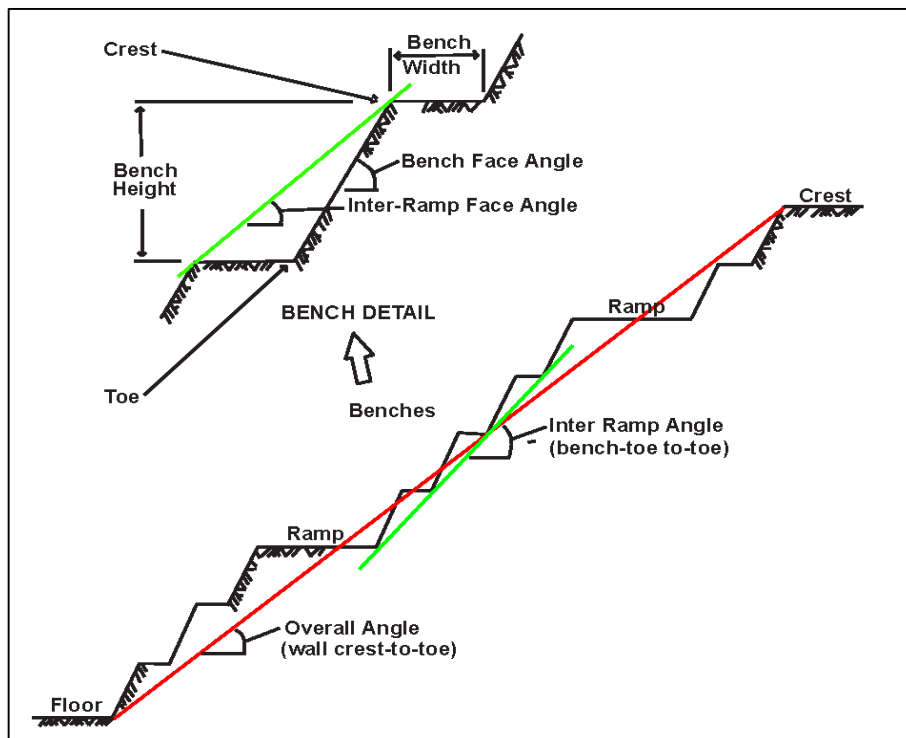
Open pit wall terminology (Read & Stacey, 2009)
